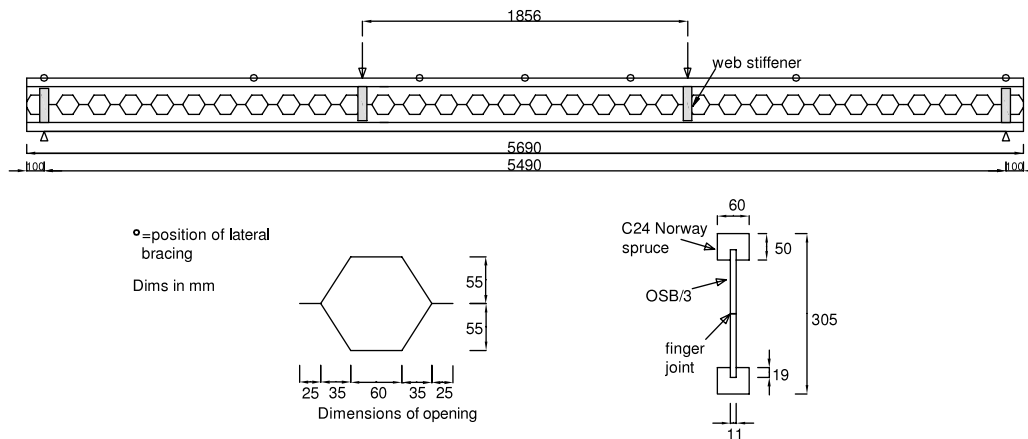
Details of 305 mm deep castellated joist – bending test arrangement.
